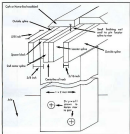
Cross section of gypser sub-roofing for flat roof or cork coated.
